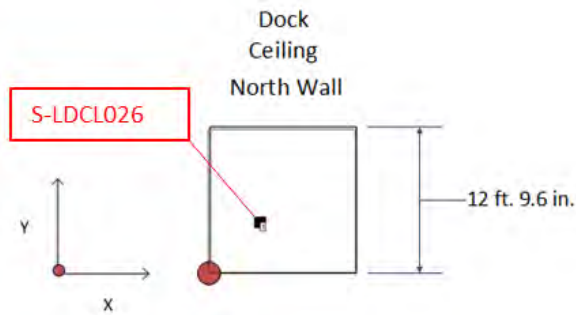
Sample Locations – Loading Dock Interior Concrete Walls and Ceiling
